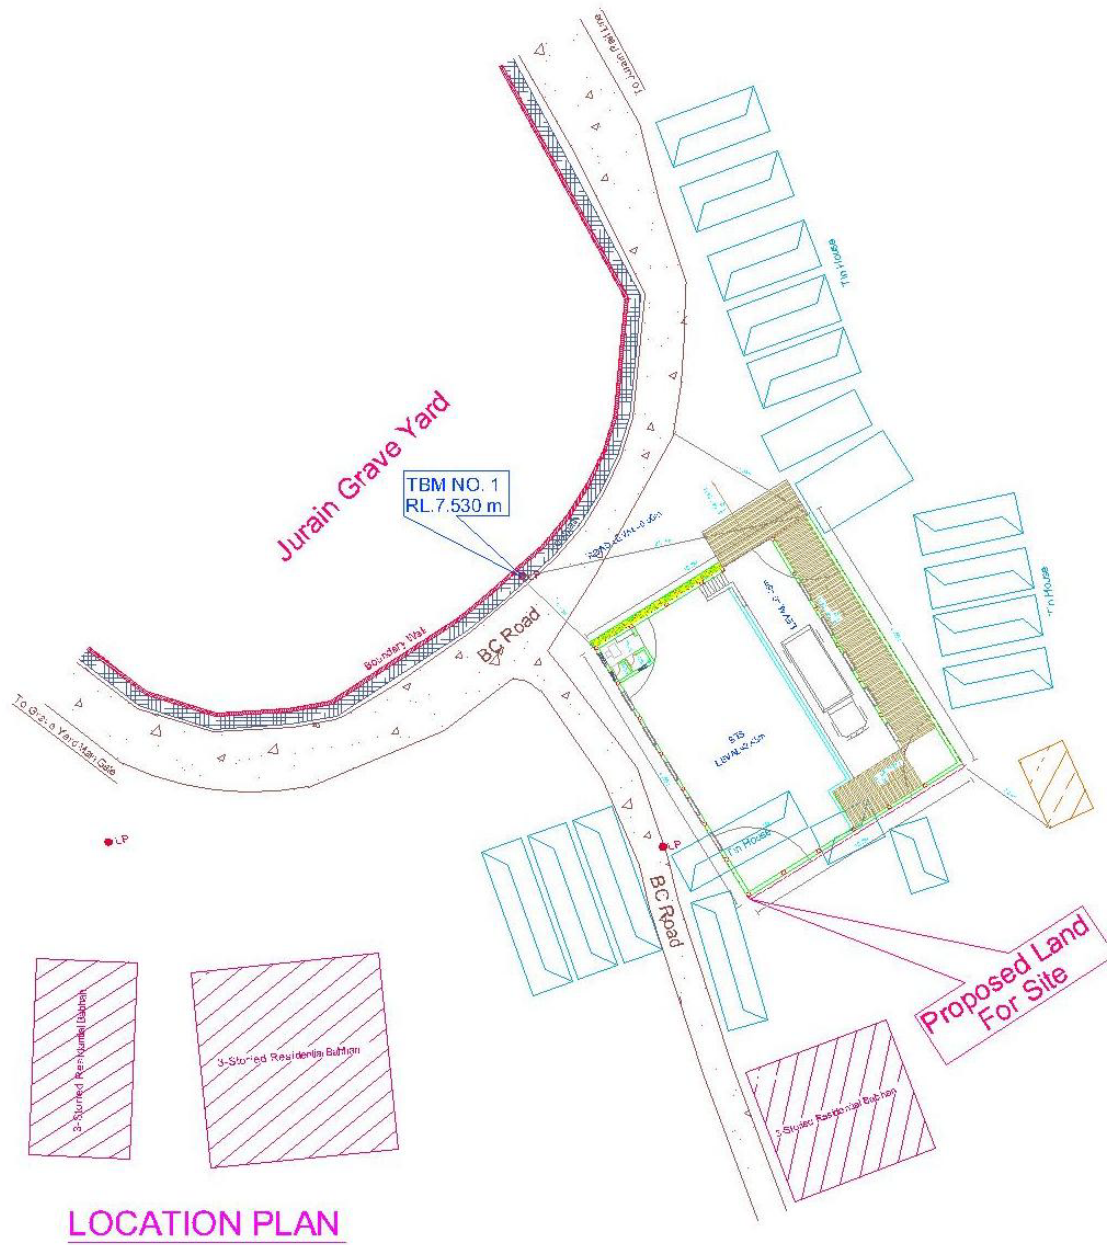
STS – 9 Jurain Kabarosthan Layout Plan (23°41'42"N, 90°25'44"E)
